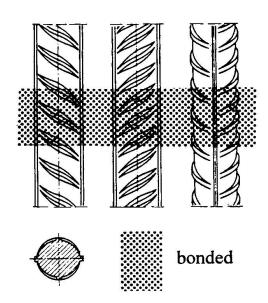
Test specimen and rib pattern of tested reinforcing bar
